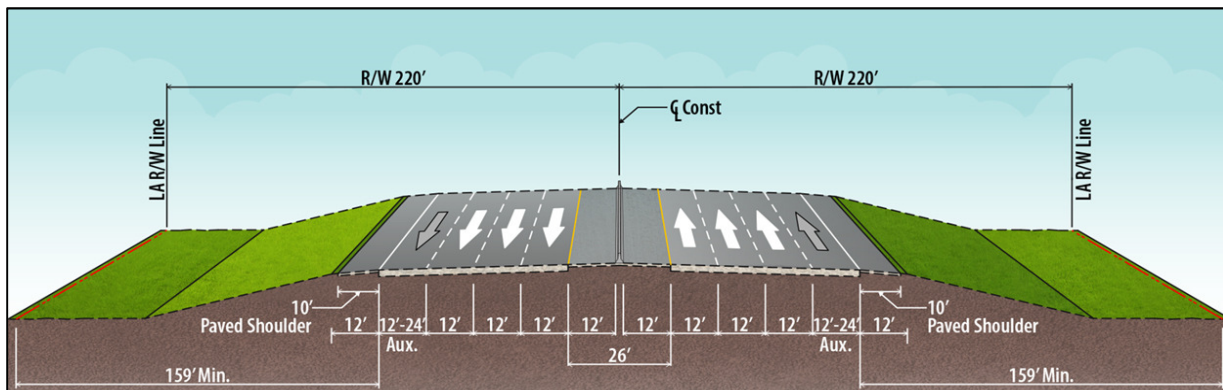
Existing I-275 Mainline Typical Section from south of 9th Street North to south of 4th Street North (Segment C-3)
